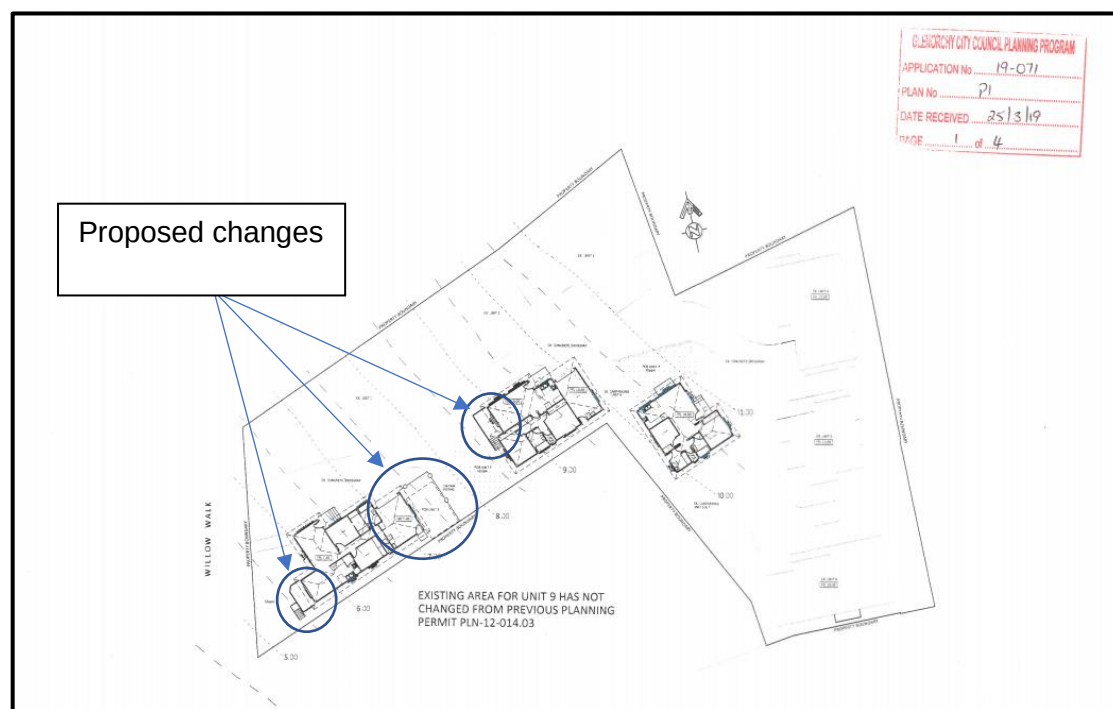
Site Plan for 3 Willow Walk, Austins Ferry.
